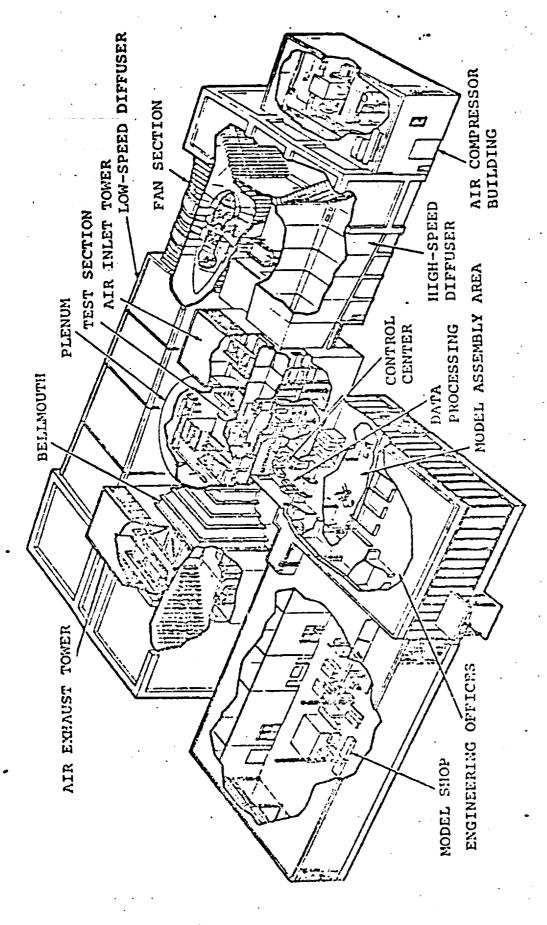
The Boeing V/STOL Wind Tunnel General Arrangement
